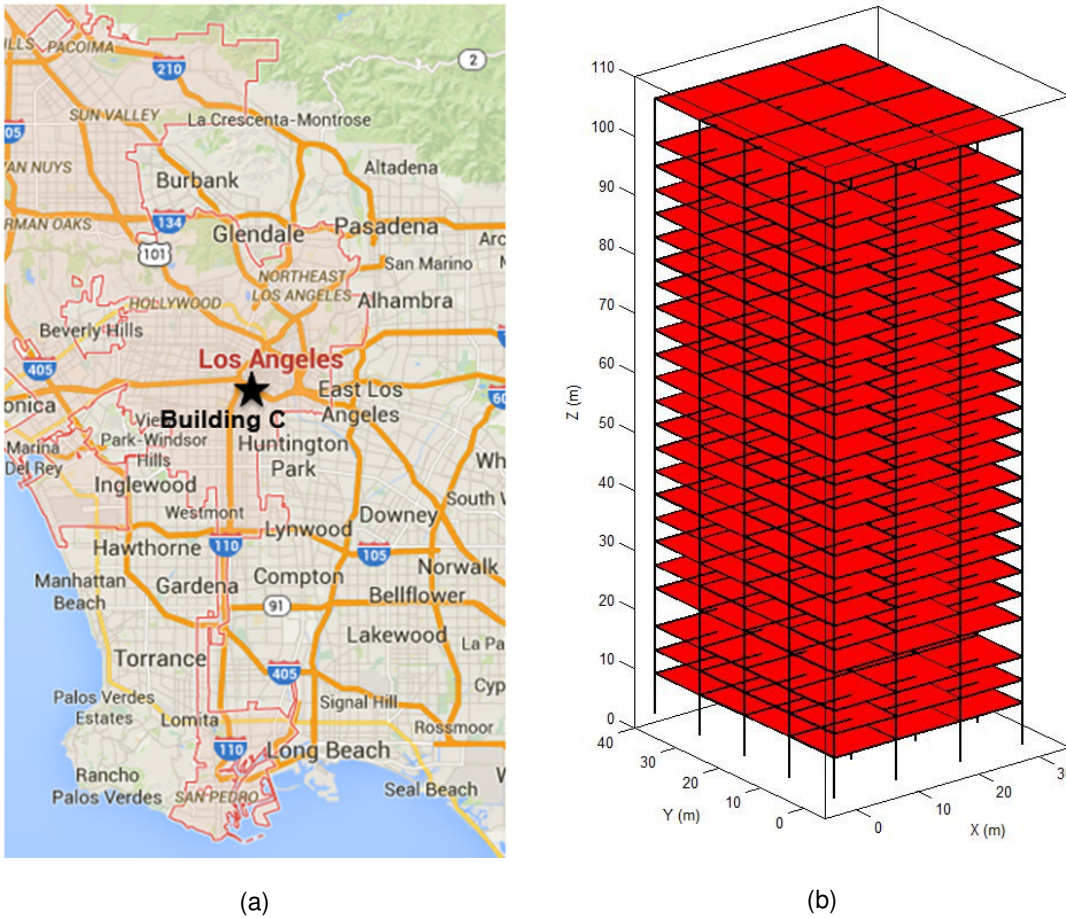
(a) Building location; and (b) Building model (Gogus et. al., 2014)
